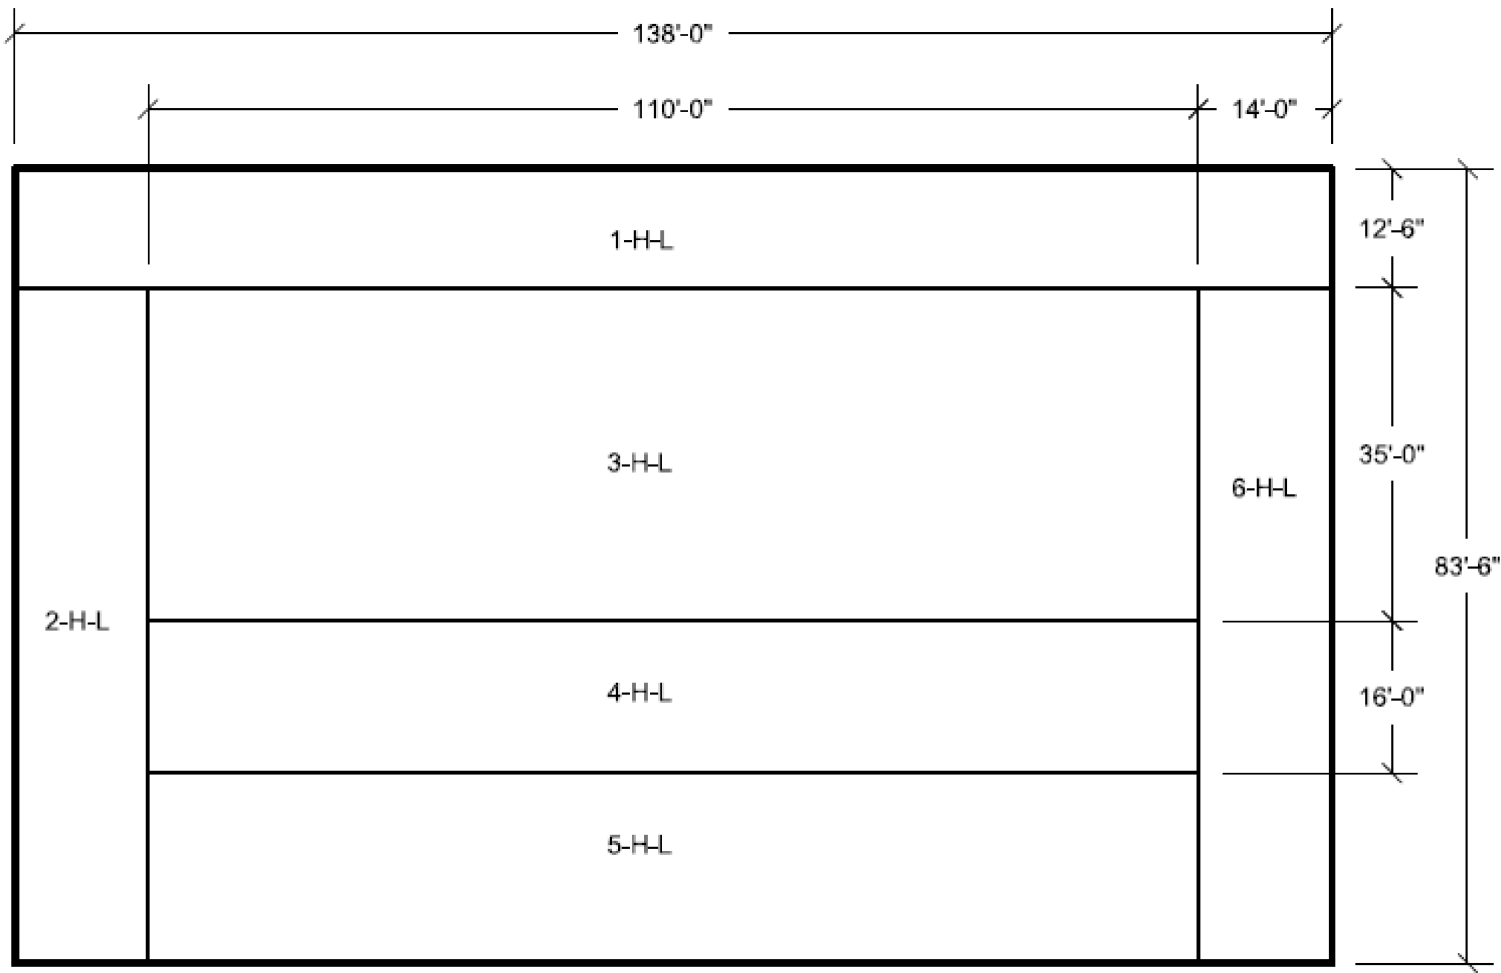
H.6-94 UHS Basin East Wall Looking West Horizontal Reinforcement Zones Far Side Face
